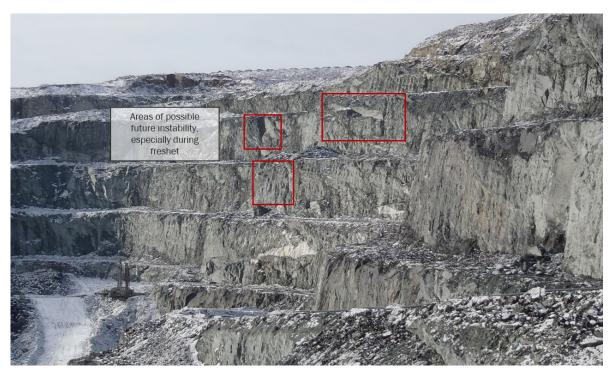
Pit E west wall showing seepage and Bay Fault (2018)
